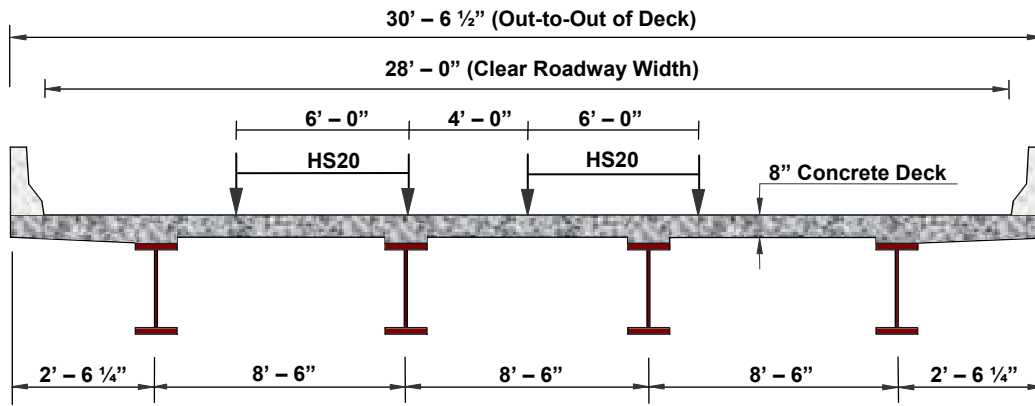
Cross-section view and horizontal loading positions for all bridges included in the WVU parametric study for cross-section 3
